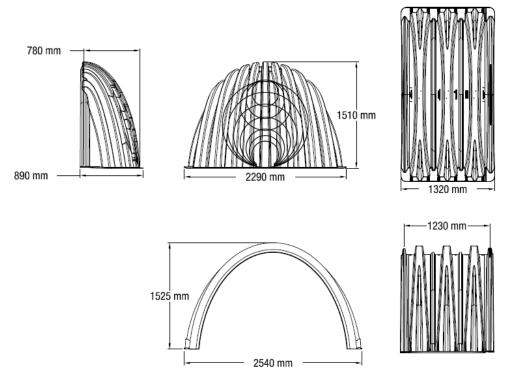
Dimensions of the STORMTECH MC4500 chamber (tolerance: 3%)
